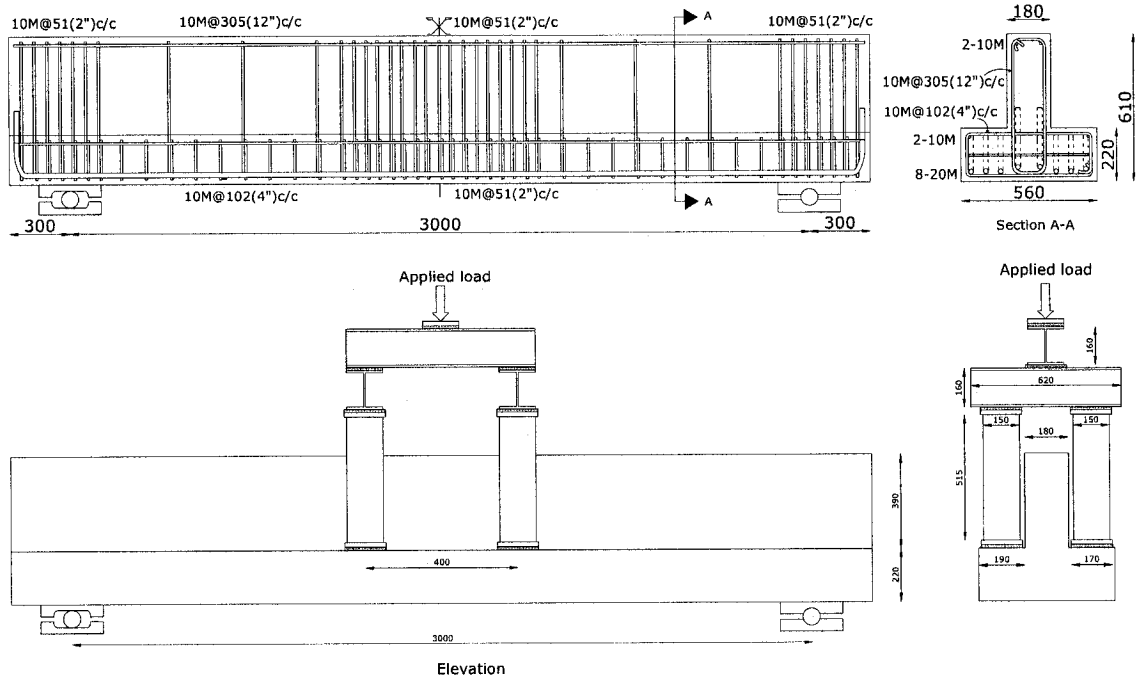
Dimensions, details of reinforcement and test profile for girder IT-G3
